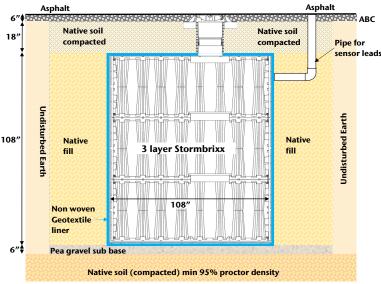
Side view drawing of the StormBrixx SD test structure as installed
